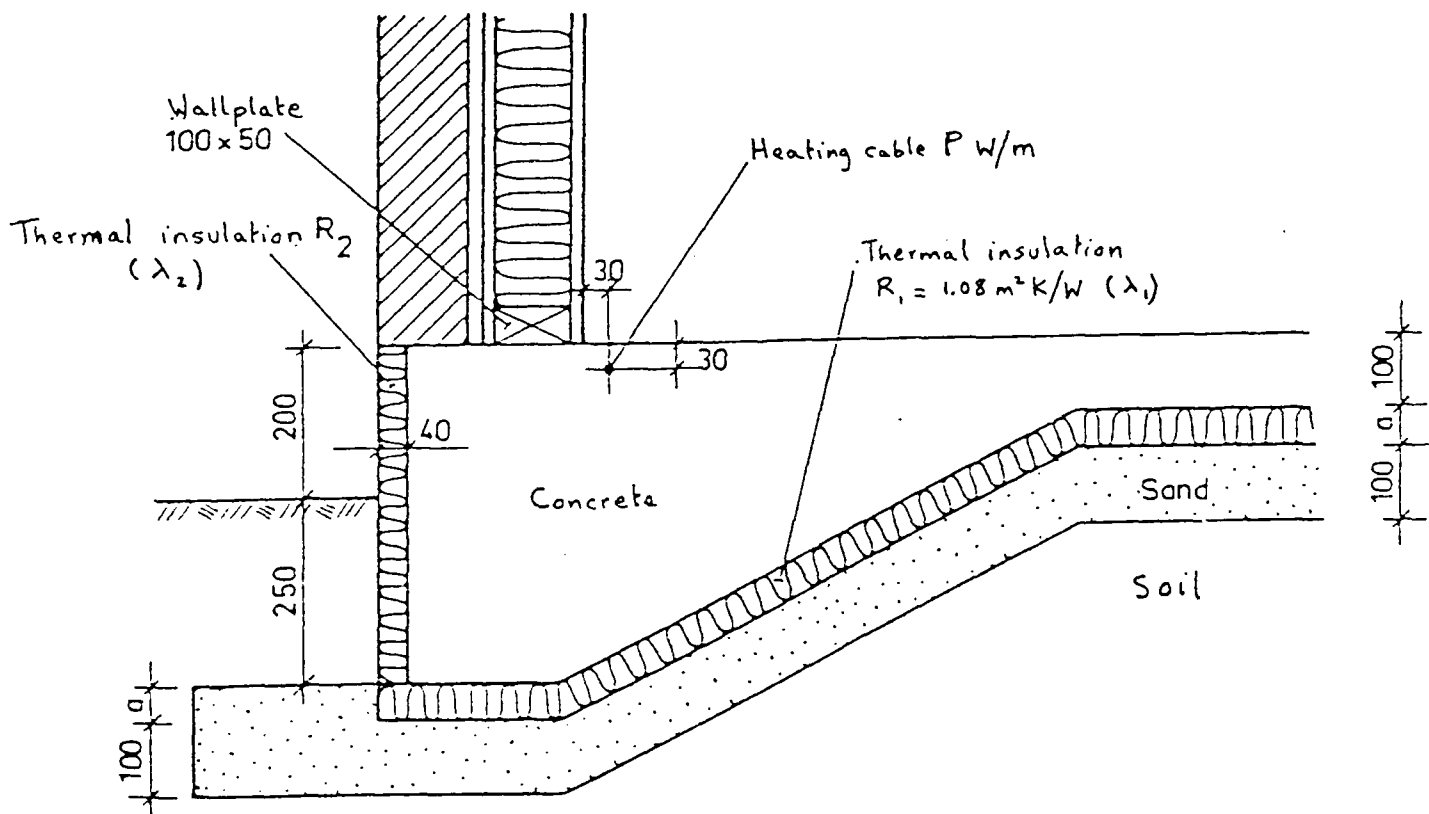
Edge-stiffened concrete slab with insulation under slab
